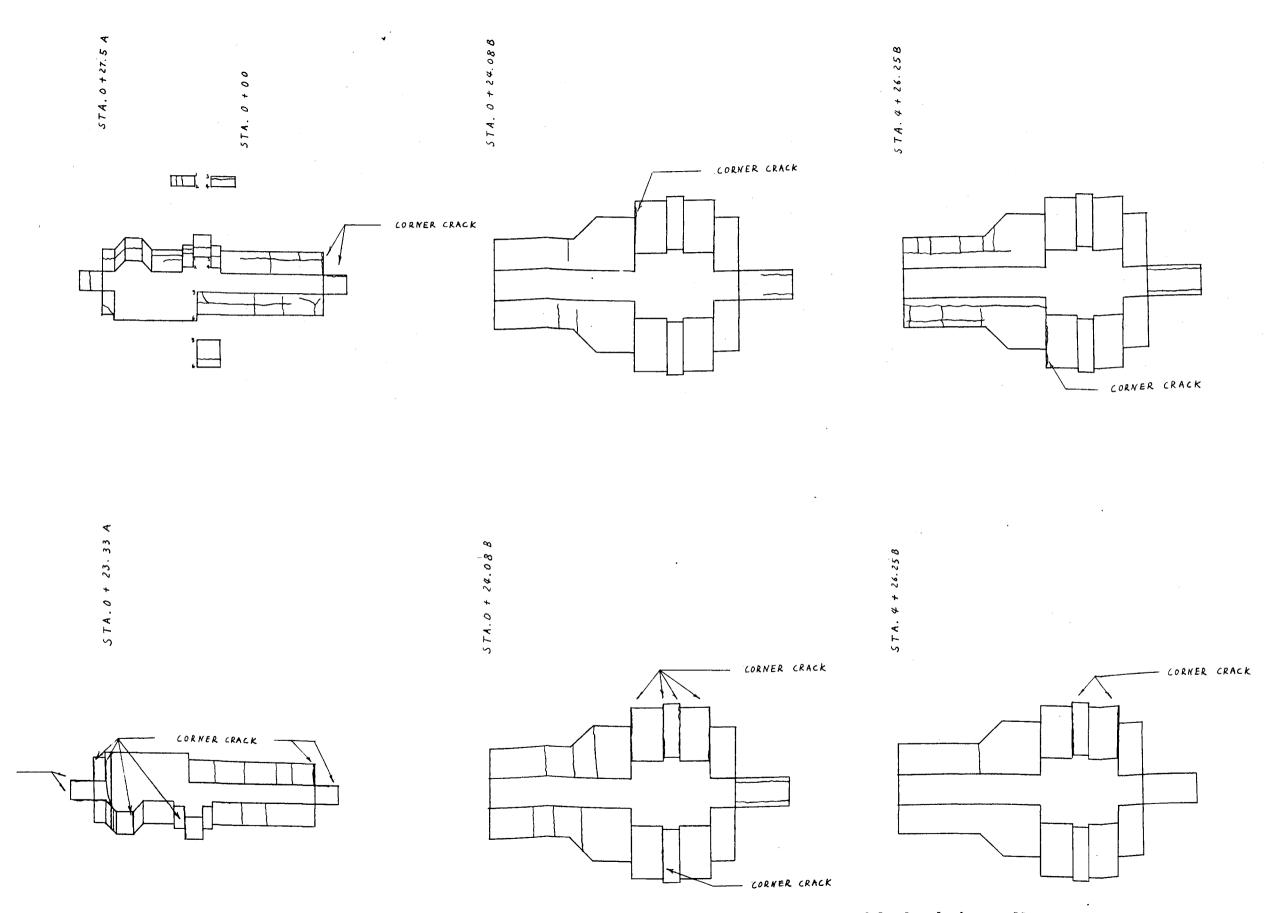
Surface cracking, pipe gallery, river wall, and lower end
